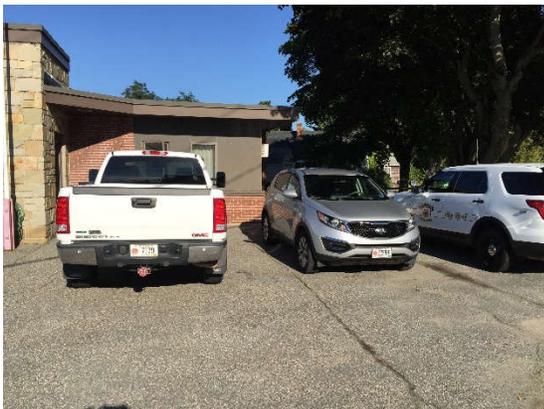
Parking and driveway on Main Street. Building entrance on side wall behind flag pole.
